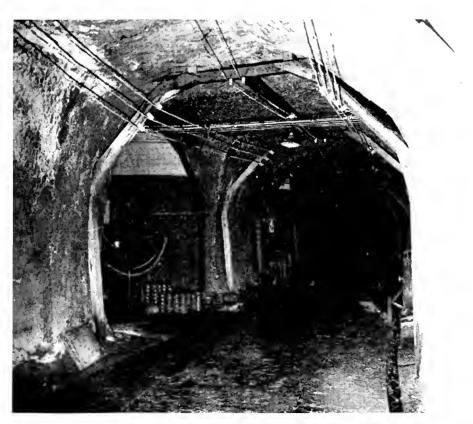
Handa plant. (Note production tunnels opening into communications tunnel.)
